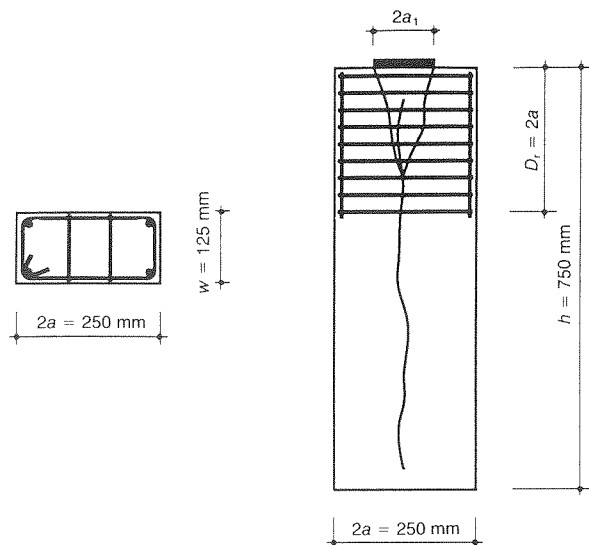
Arrangement of the test specimens, showing typical steel reinforcement and final wedging failure
